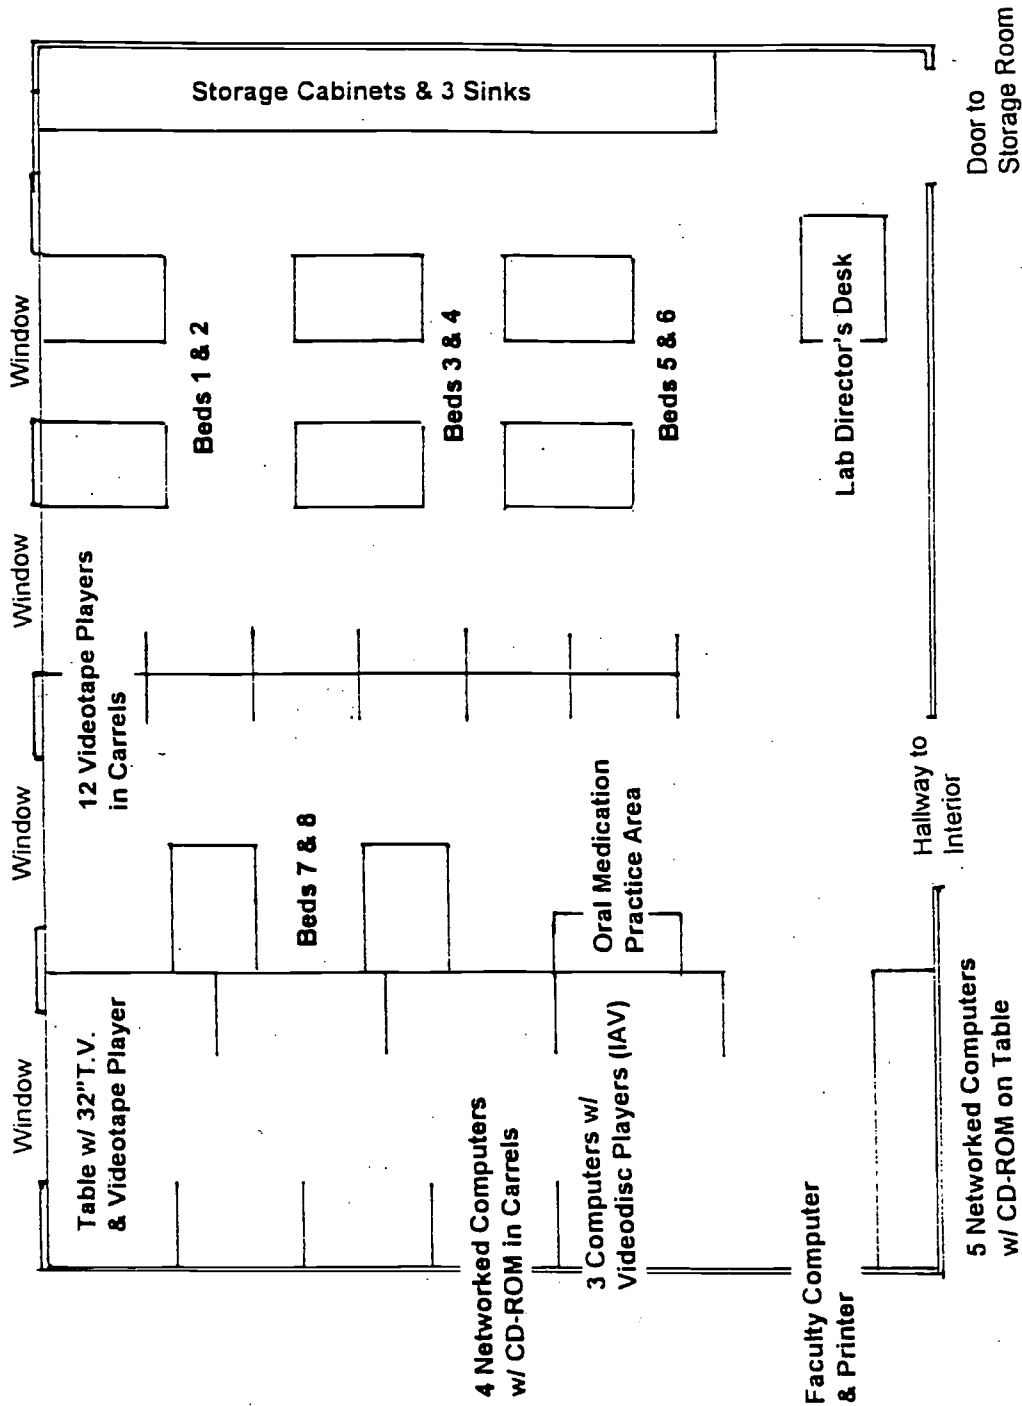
Floor Plan of Nursing Laboratory at Forest Community College
